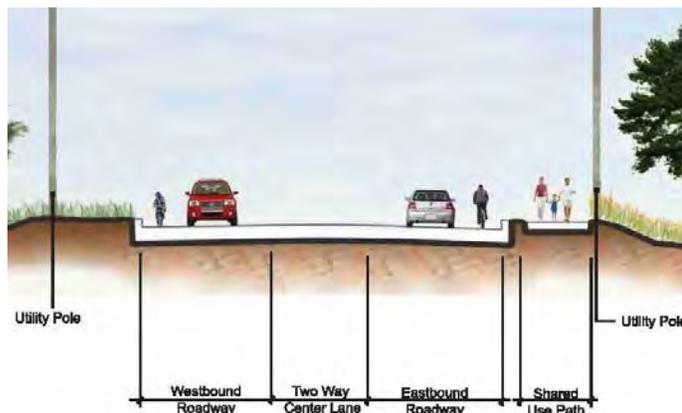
Alternative 2 Access Management Option Center Turn Lane Improvement Segment C Typical Section
